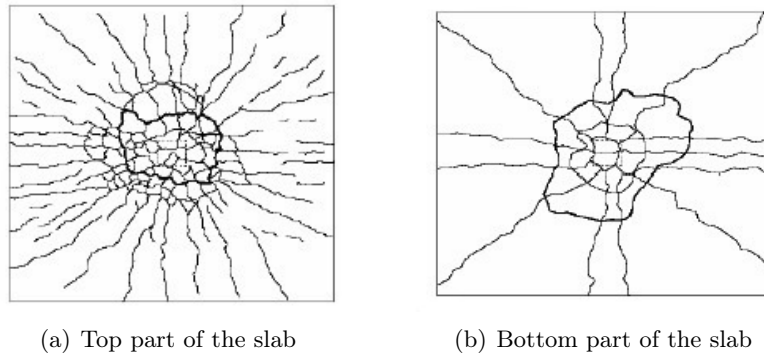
Example of punching cracking at a slab-beam connection
